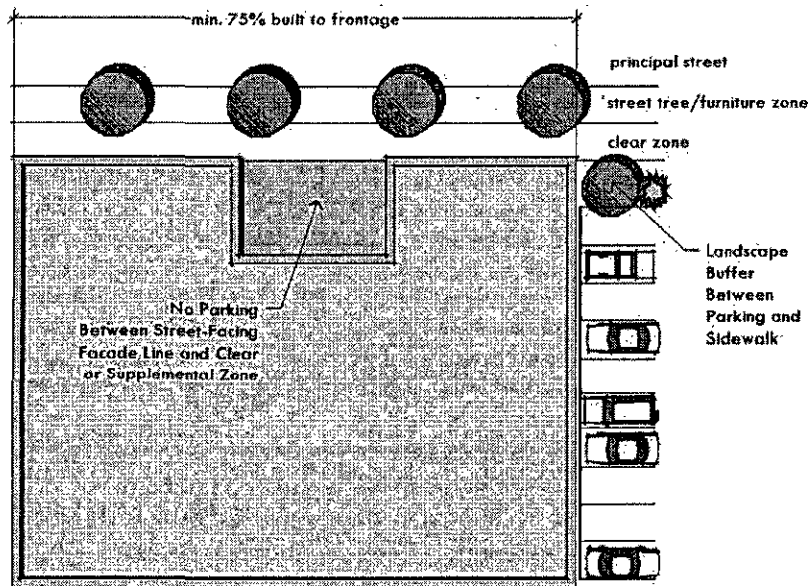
Parking to the side of a building is permitted but screening is required between the parking and the sidewalk. No parking is permitted between the building and the sidewalk on a Core Transit Corridor.
